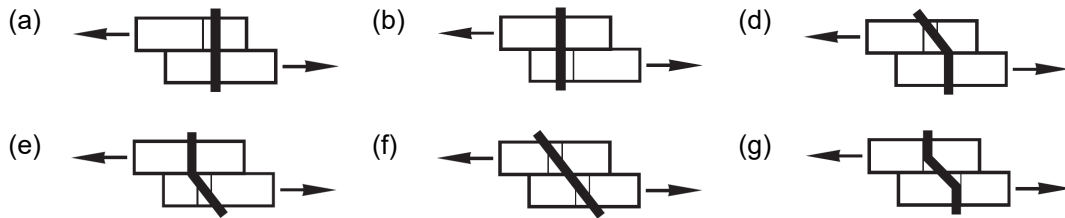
Failure modes applicable to connections with a single shear plane (adapted from CSA O86-14).
